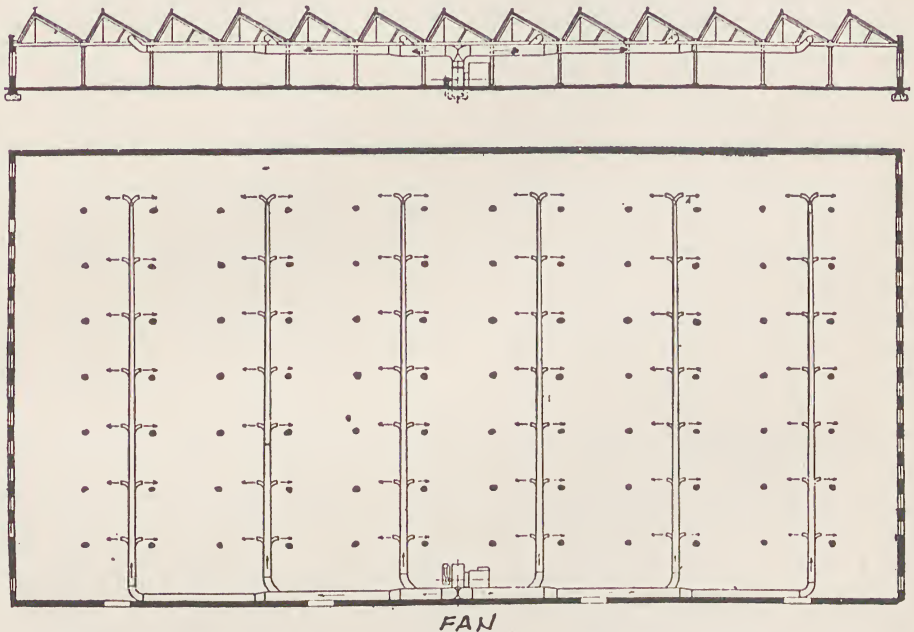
Plenum ventilation system with overhead ducts and outlets. Fresh air is forced into the building through the duct outlets and vitiated air forced out through windows and doors.
